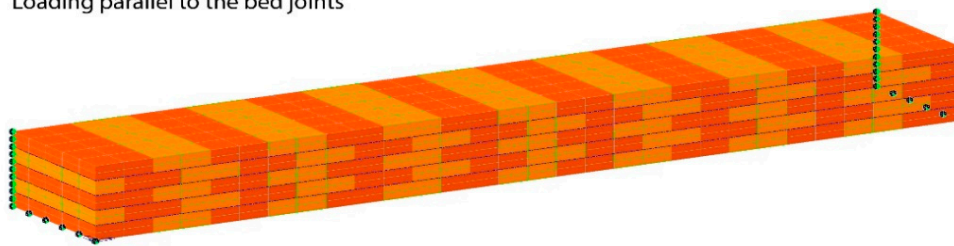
Finite Element Model: constraints of a beam made by five layers of solid clay bricks 60 mm thick for loading parallel to the bed joints.
